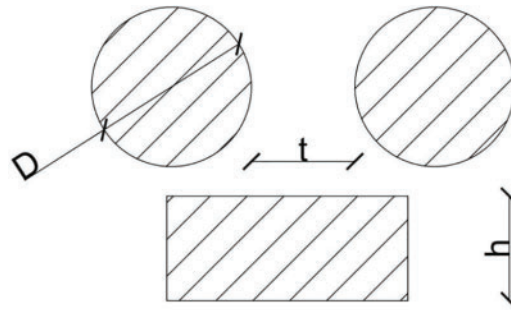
Schematic diagram of row pile equivalent to ground wall model
